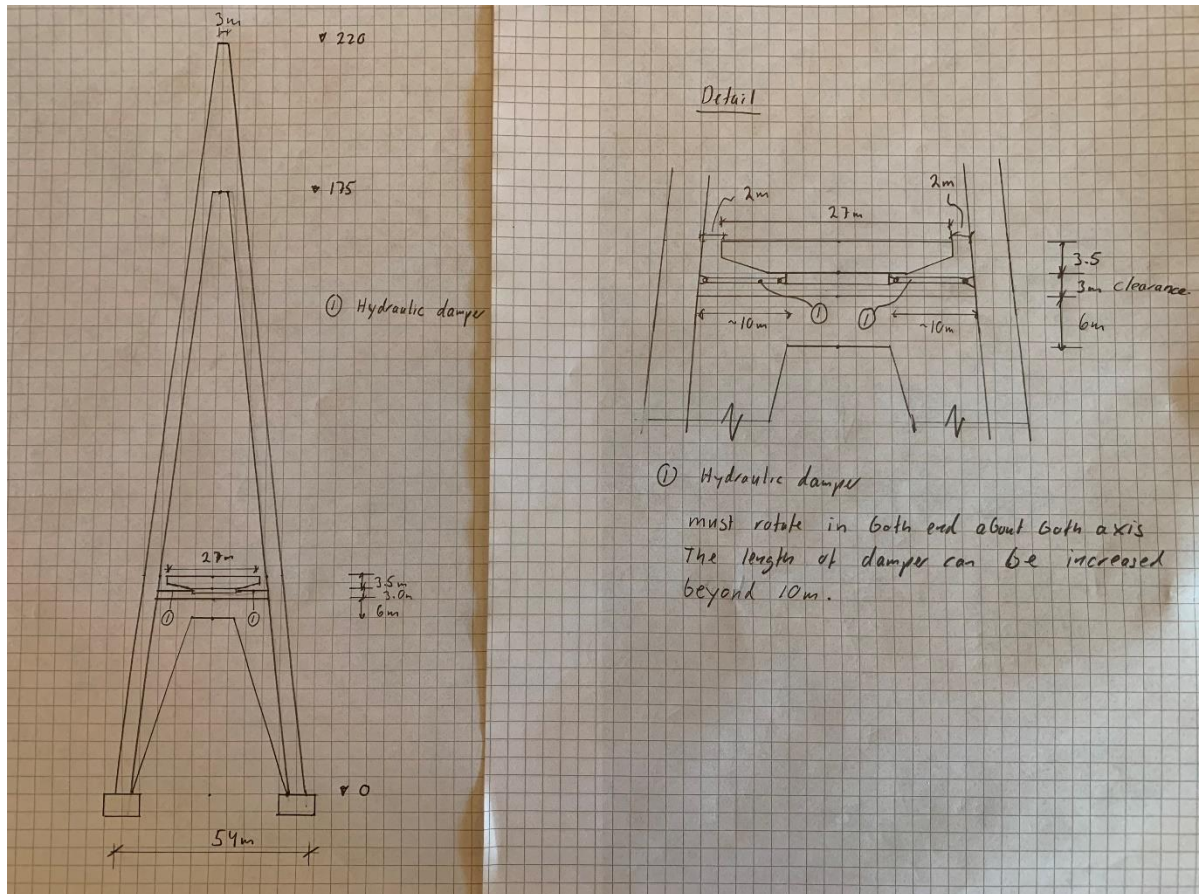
Illustration of the adjusted tower and indicative placement of the two hydraulic dampers between tower and bridge girder. The tower is adjusted to obtain sufficient clearance between bridge girder and tower, to allow for damper displacement.
